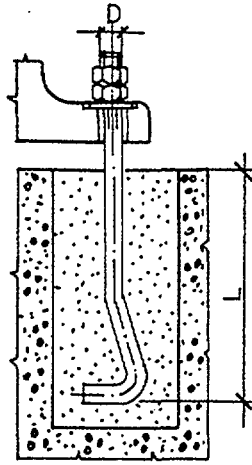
J-Shaped Anchor Bolts Grouted in Beforehand Made Large Size Holes
